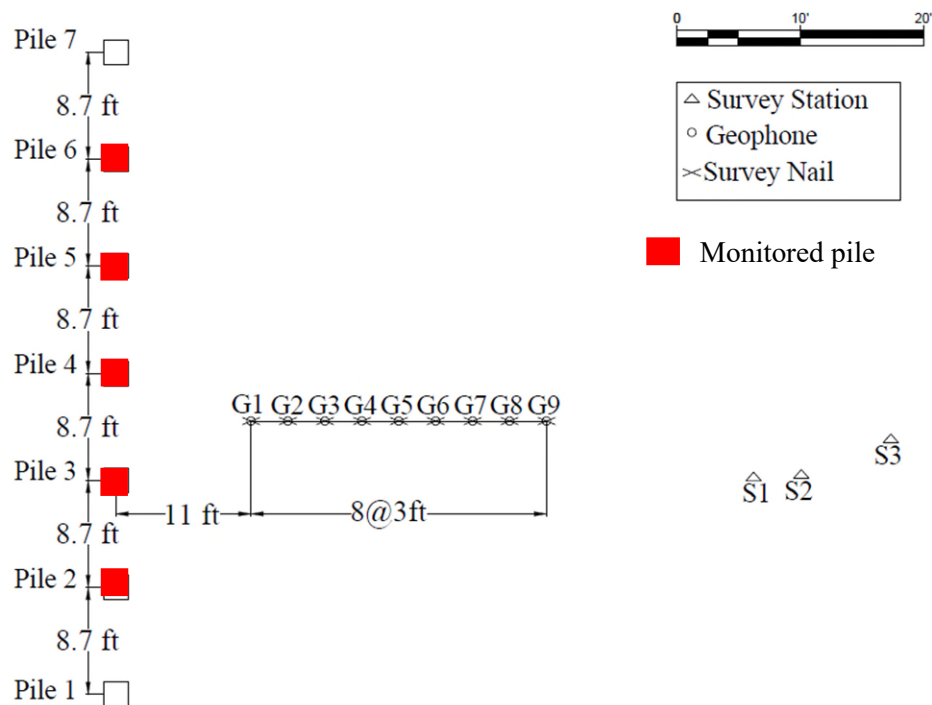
Plan view of the instrumentation layout showing location of geophones, survey nails, and survey stations used to collect data during driving of piles 2 through 6 at Site C.
